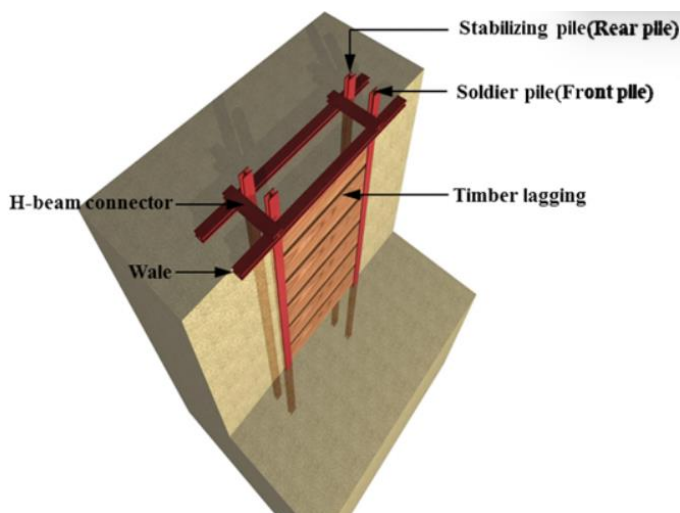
Components of a Self-Supported Earth-Retaining Wall with Stabilizing Piles (Sim et al., 2005)
